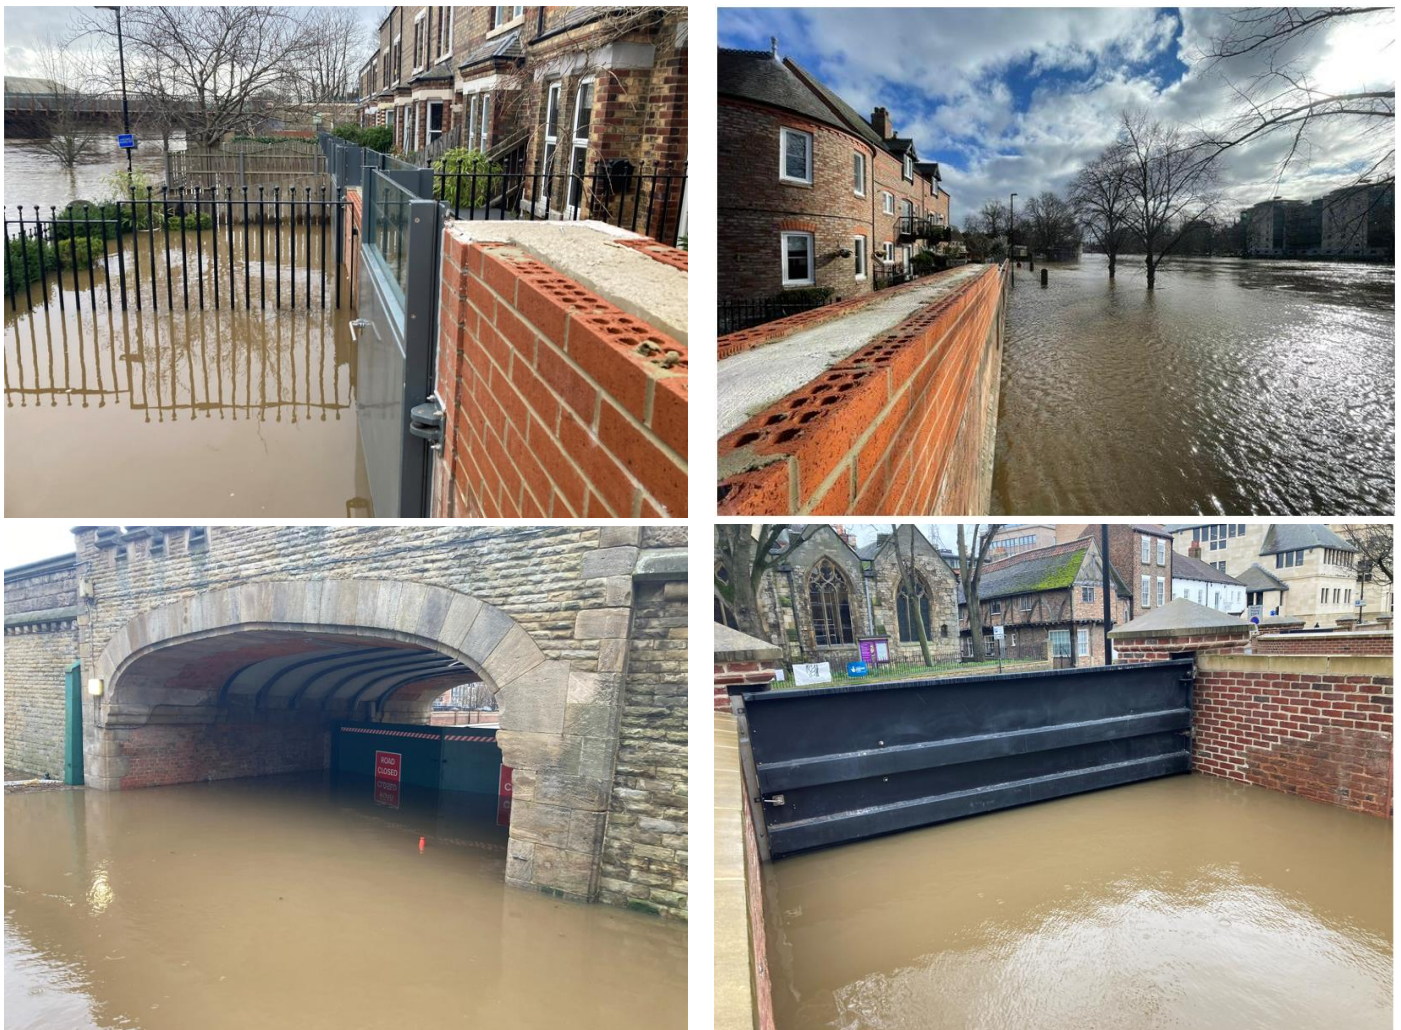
Clockwise from top left. Almerly Terrace, Esplanade Close, North Street, Lendal Arch.
